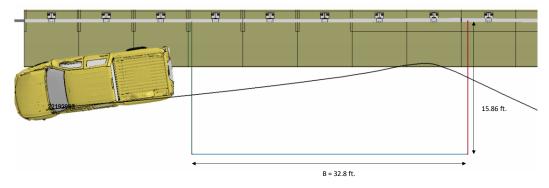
Exit box for Test 4-11 for sidewalk-mounted system.
